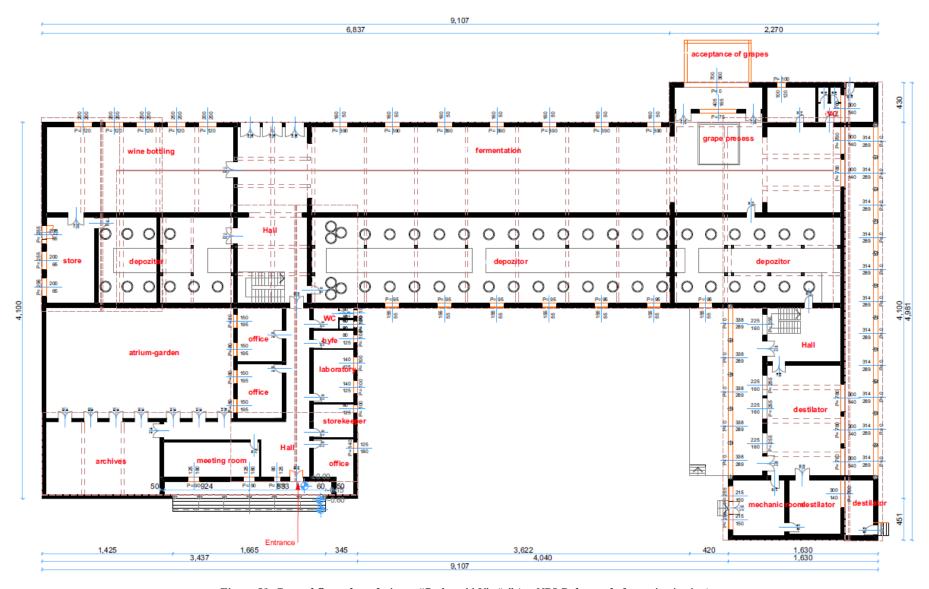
Ground floor plan of winery "Bodrumi i Vjetër" (ex-NBI-Rahovec, before privatization)
